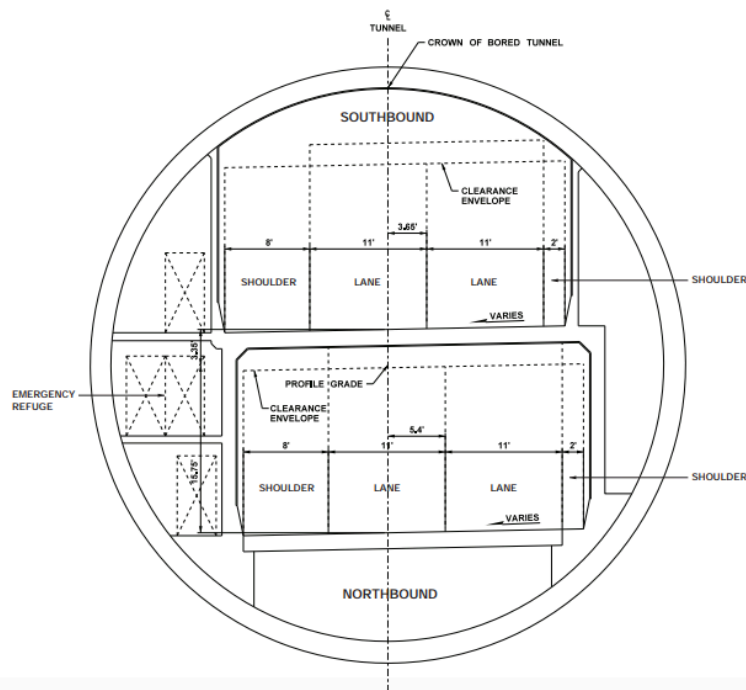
Cross-section of bored tunnel alternative, (entirely underground with least ground-level construction) From Washington State Department of Transportation, “Alaskan Way Viaduct Replacement Project Final EIS Alternatives Description and Construction Methods Discipline Report,” 2011. <http://data.wsdot.wa.gov/publications/viaduct/AWVFEIS-AppendixB.pdf>
